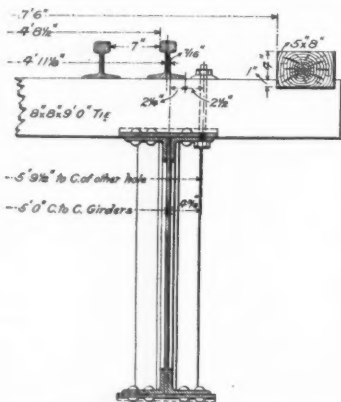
Details of Lift Span — Section Through Stringer, Rail and Guards.
